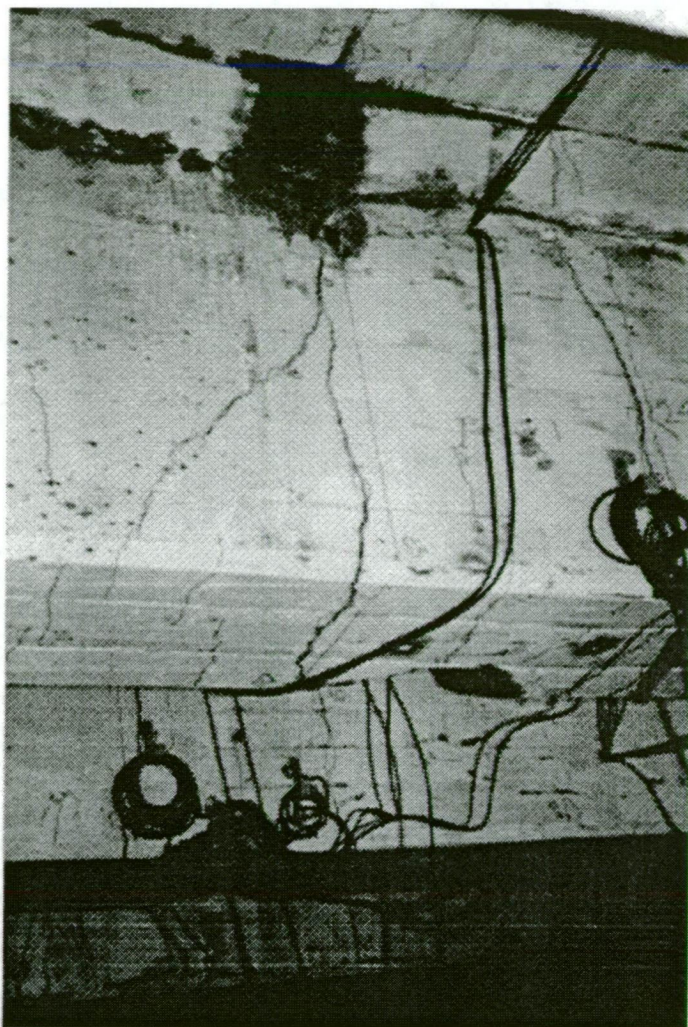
Cracking of Second Beam at Ultimate Load
